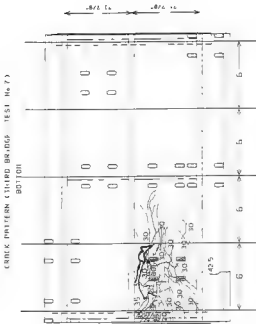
Bottom Cracking Pattern (Third Bridge - Test No 7)
